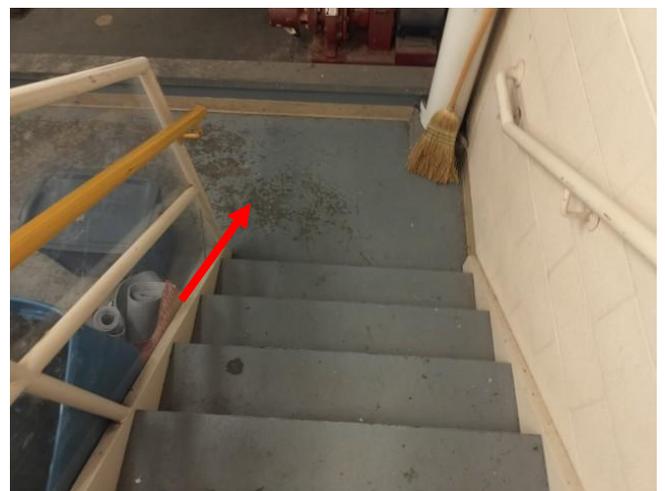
View of the low-level lead containing grey paint (see arrow) observed to be in fair condition on the floor of the Mechanical Room.
